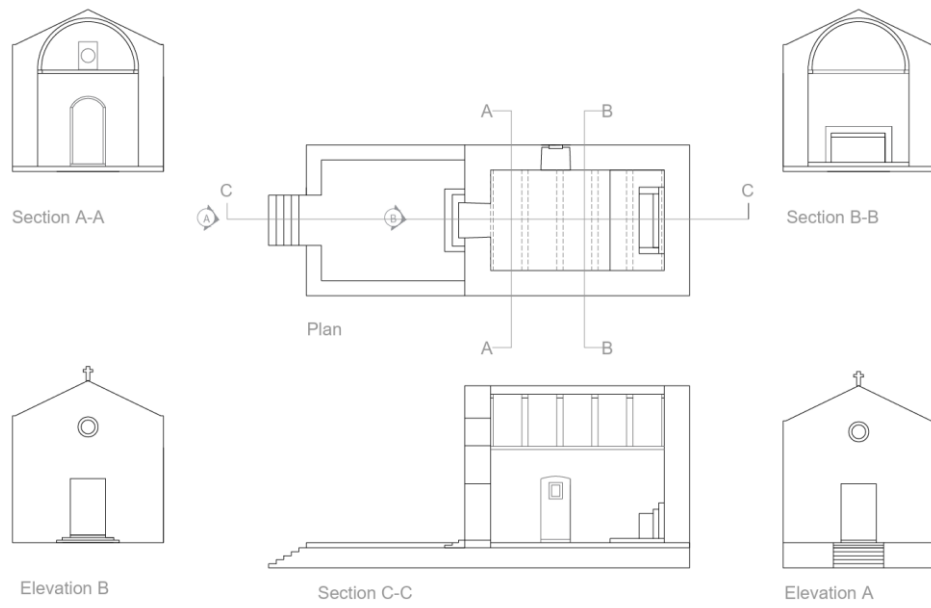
Plan, Sections and Elevations of St Mary Magdalene Chapel (Author, 2024).
